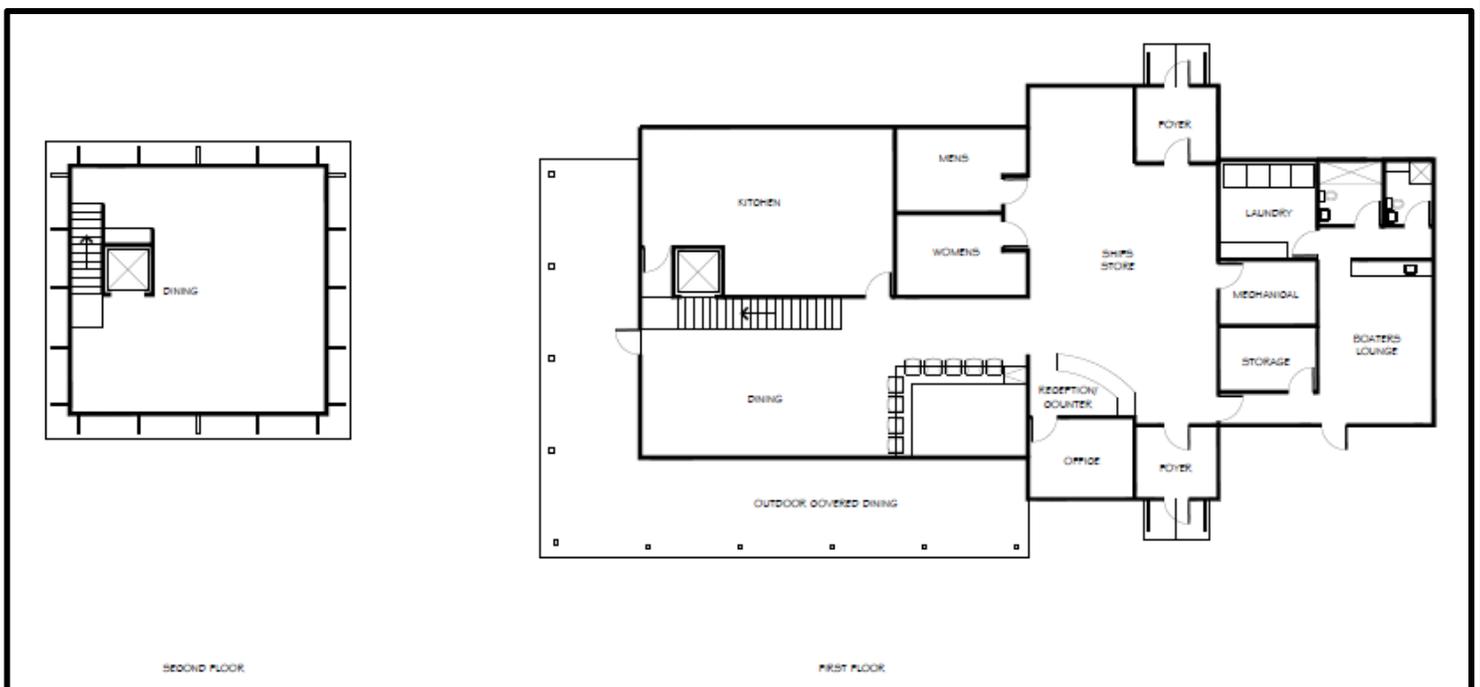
proposed restaurant floor plan (outdoor area overlooks river)
